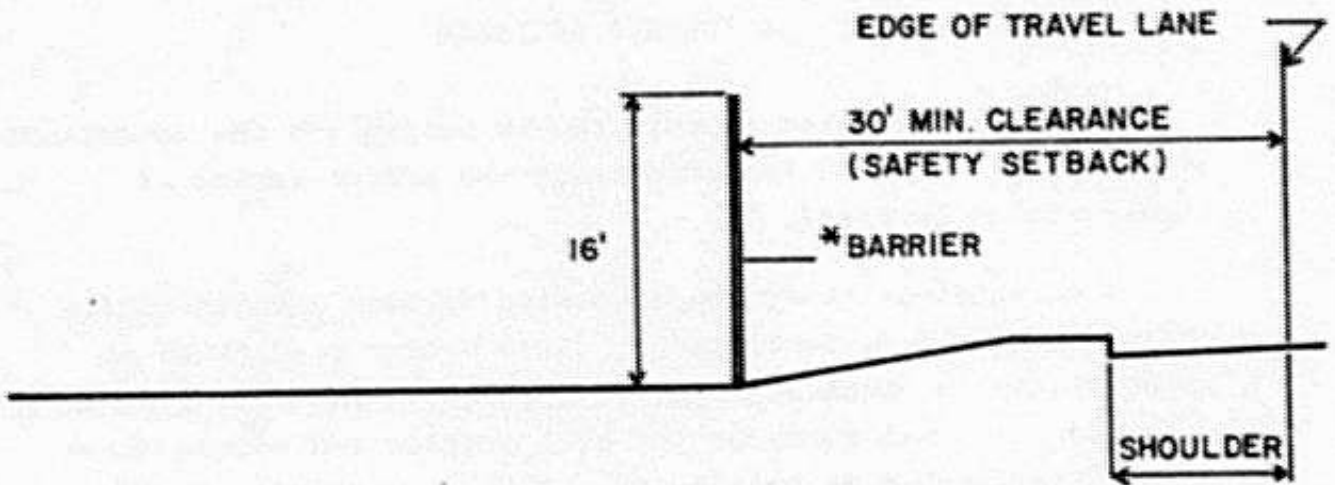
ALTERNATE TYPICAL CROSS-SECTION, HIGHWAY-NOISE BARRIERS TYPE 4 THRU 7
